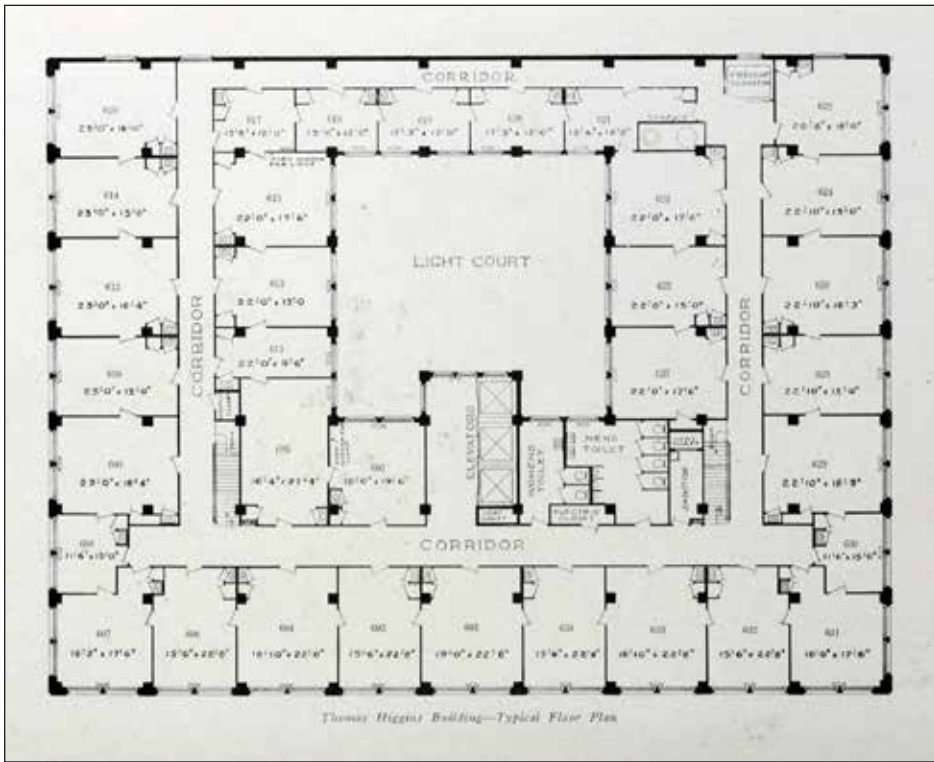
Plan of a typical office floor of the Higgins Building. Notice the light court, which extended upward from the ceiling of the first floor, allowing windows on each of the office floors for light and ventilation. Haley, “A Ten Story Monolithic Reinforced Concrete Building,” 48.
